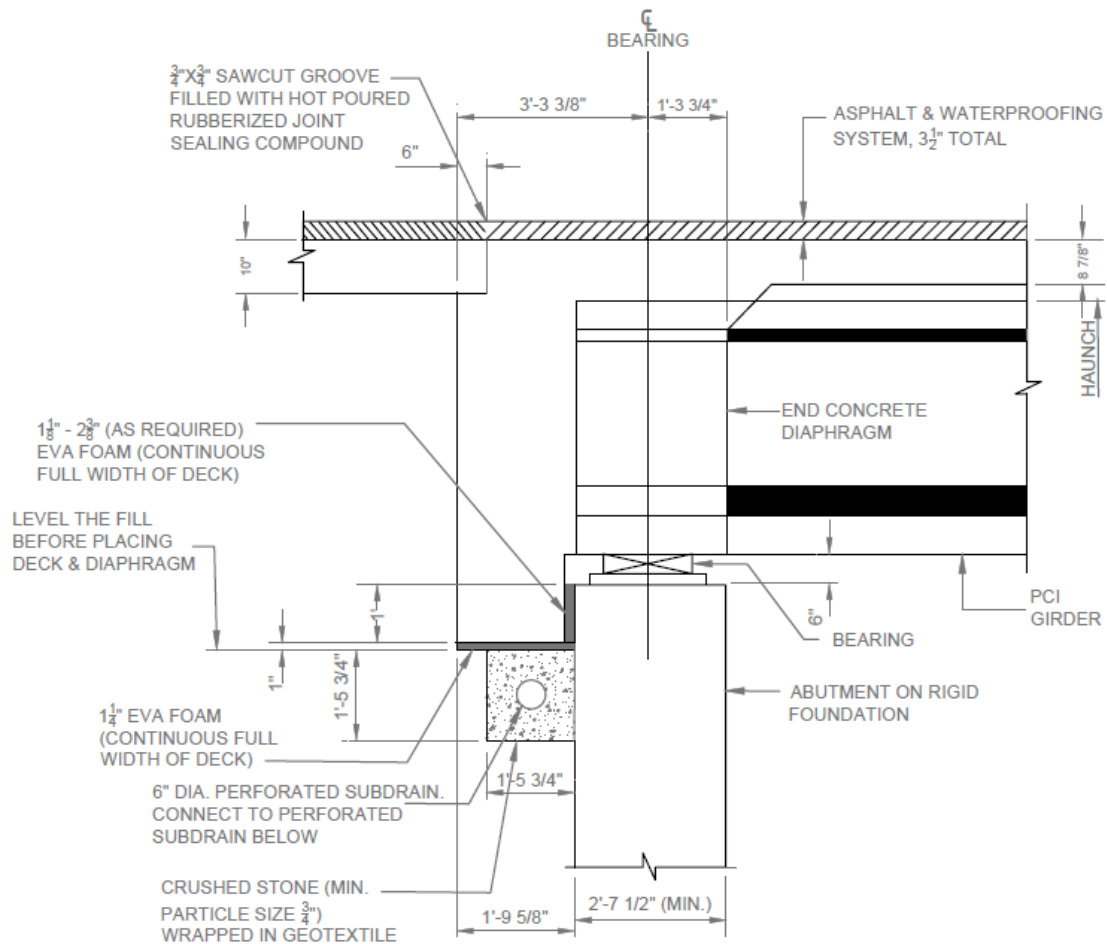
Semi-integral abutment detail with end diaphragm moving over a fixed abutment
